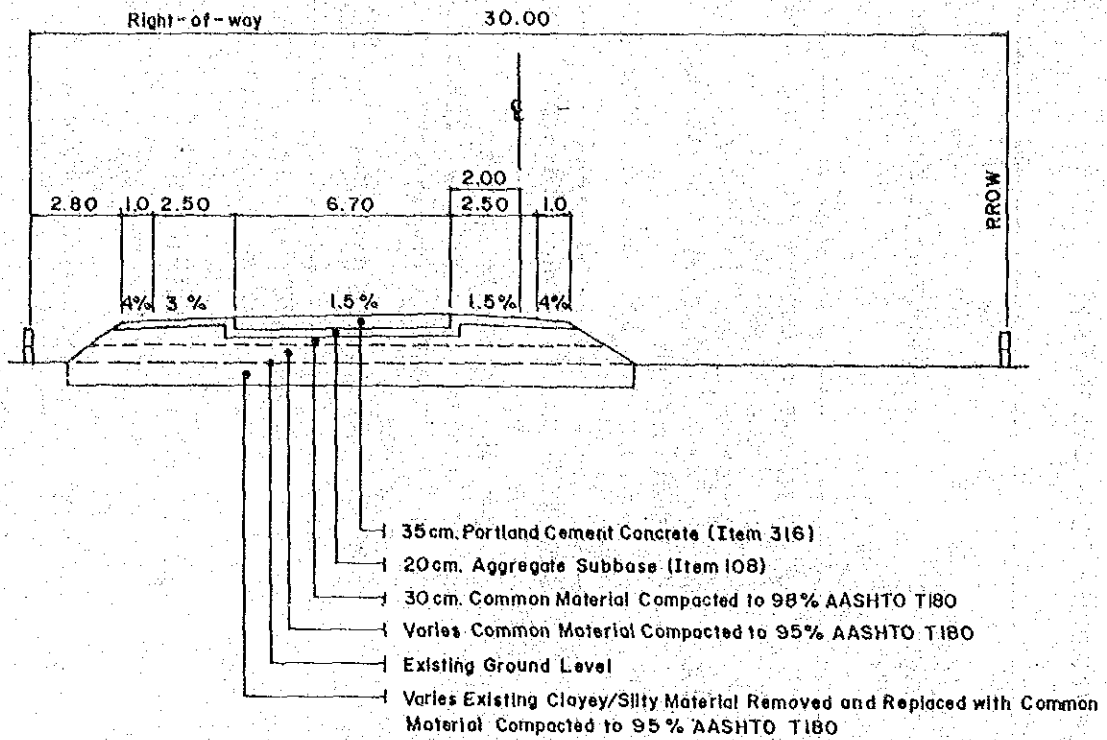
TYPICAL SECTION, PLARIDEL BYPASS
